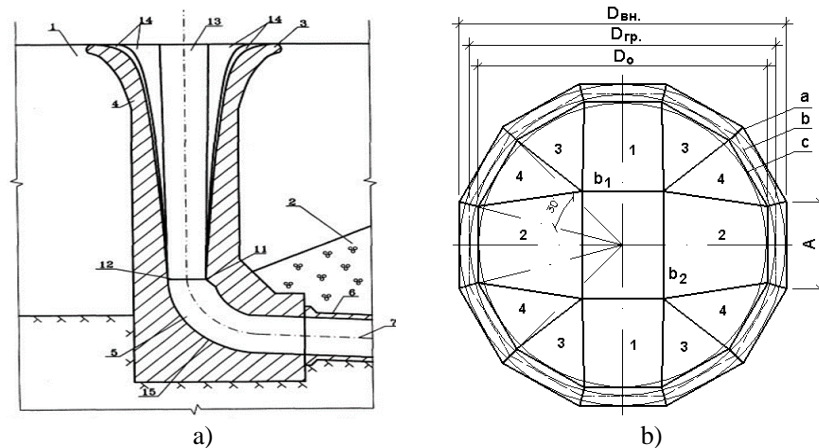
a) shows the vertical sectional view of a weir in wells along the longitudinal axis of the discharge pipe; b) Plan of the shaft of the polygonal cross-section with a 12-hole water inlet funnel, (1, 2) - Trapezoidal faces; (3, 4) - corner faces.
